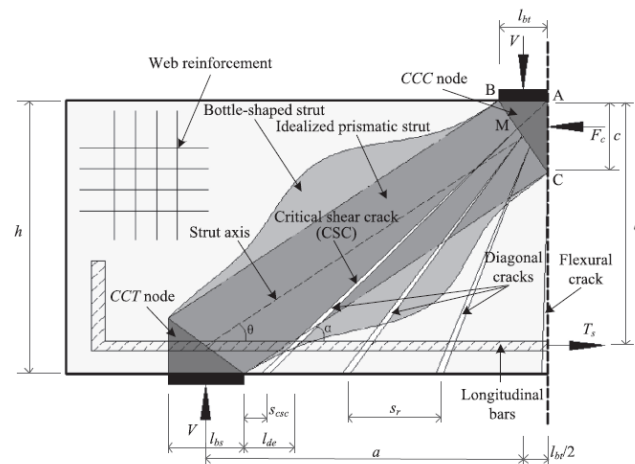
Configuration of strut and cracks of deep beams in CSTM.
